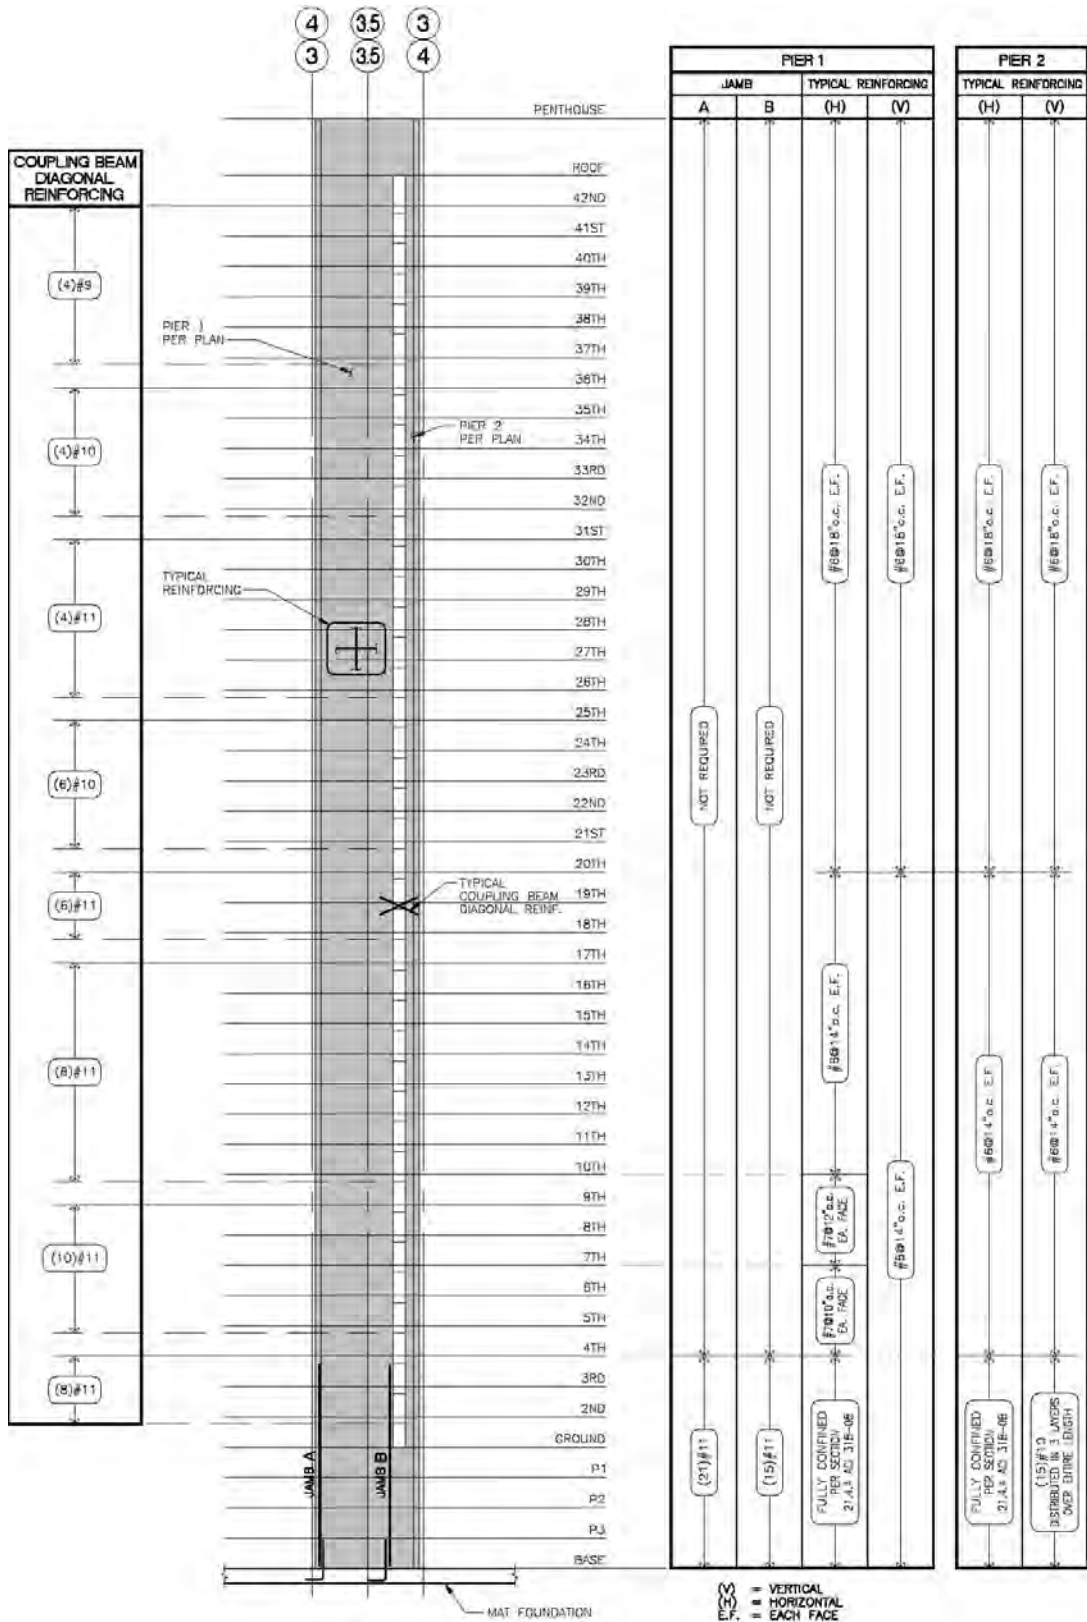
Elevation B and shear wall reinforcing for building 2A
